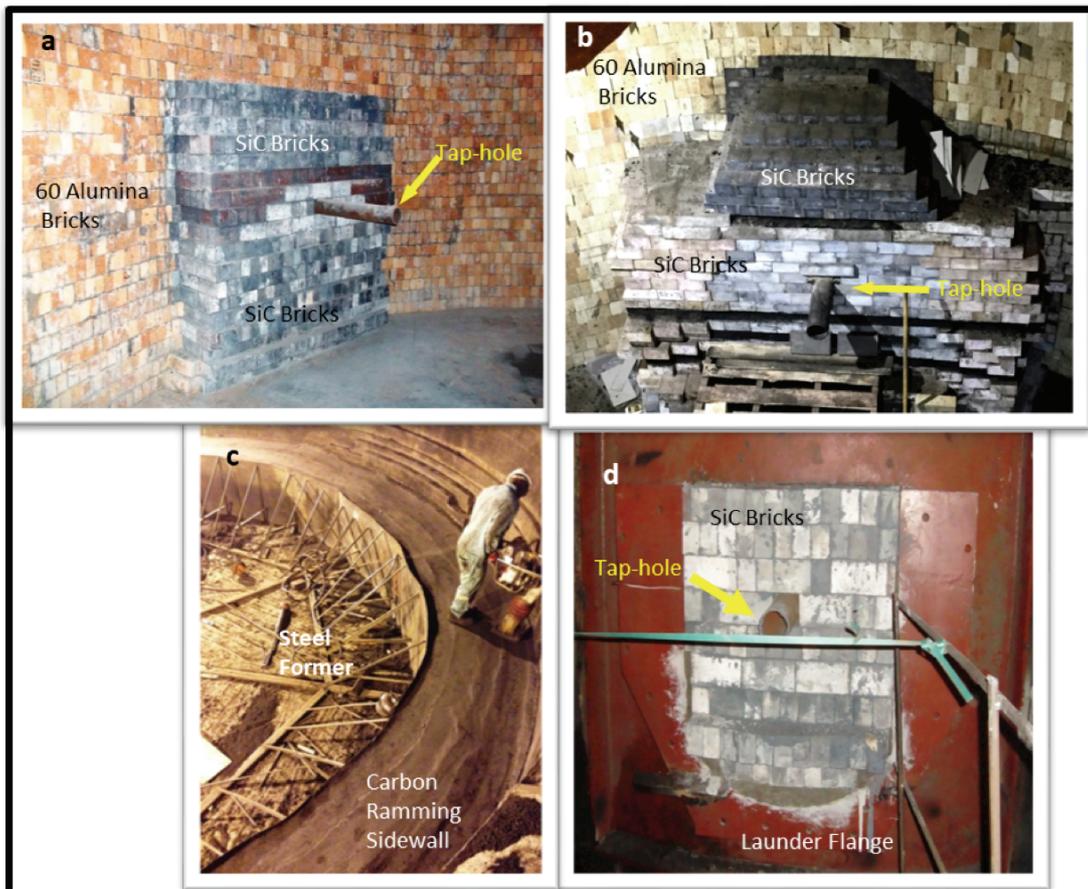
(a) Square SiC tap-hole design inside carbon bricks; (b) inside of tap-hole showing the staggered design of SiC bricks; (c) sidewall carbon ramming being installed; (d) outside view of SiC bricked tap-hole.
